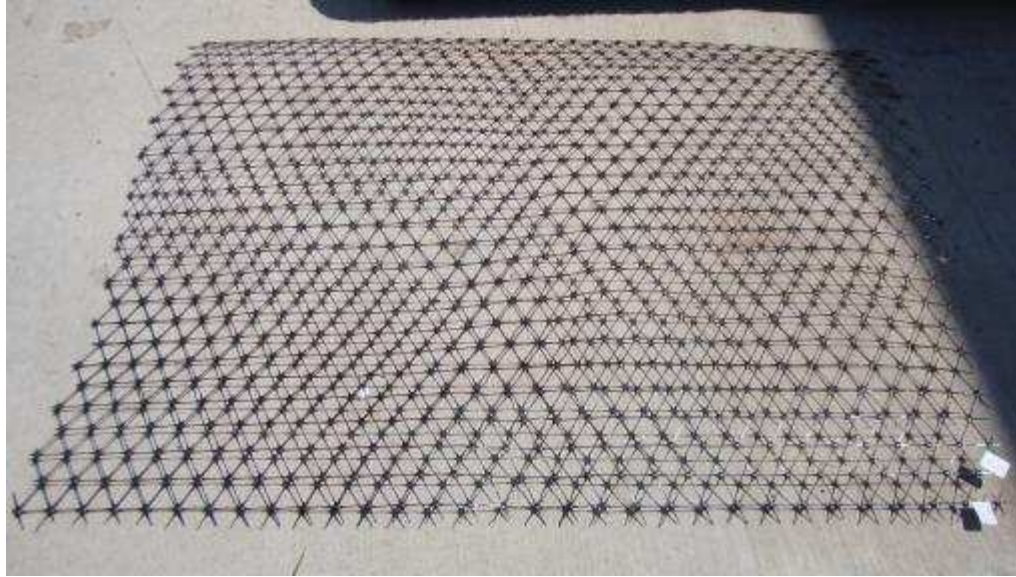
EGG3 geogrid specimen prepared for installation damage tests
